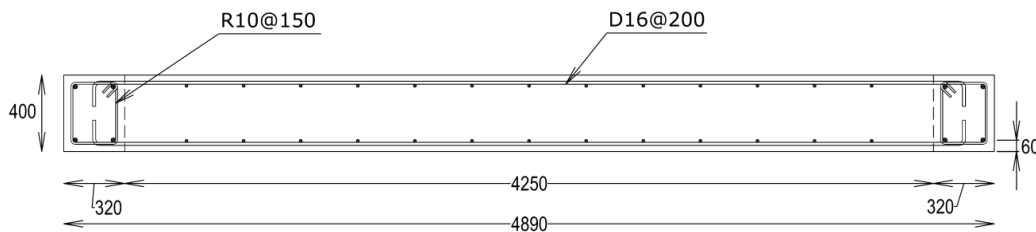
Details of the wall used for the parametric study on longitudinal reinforcement ratio
